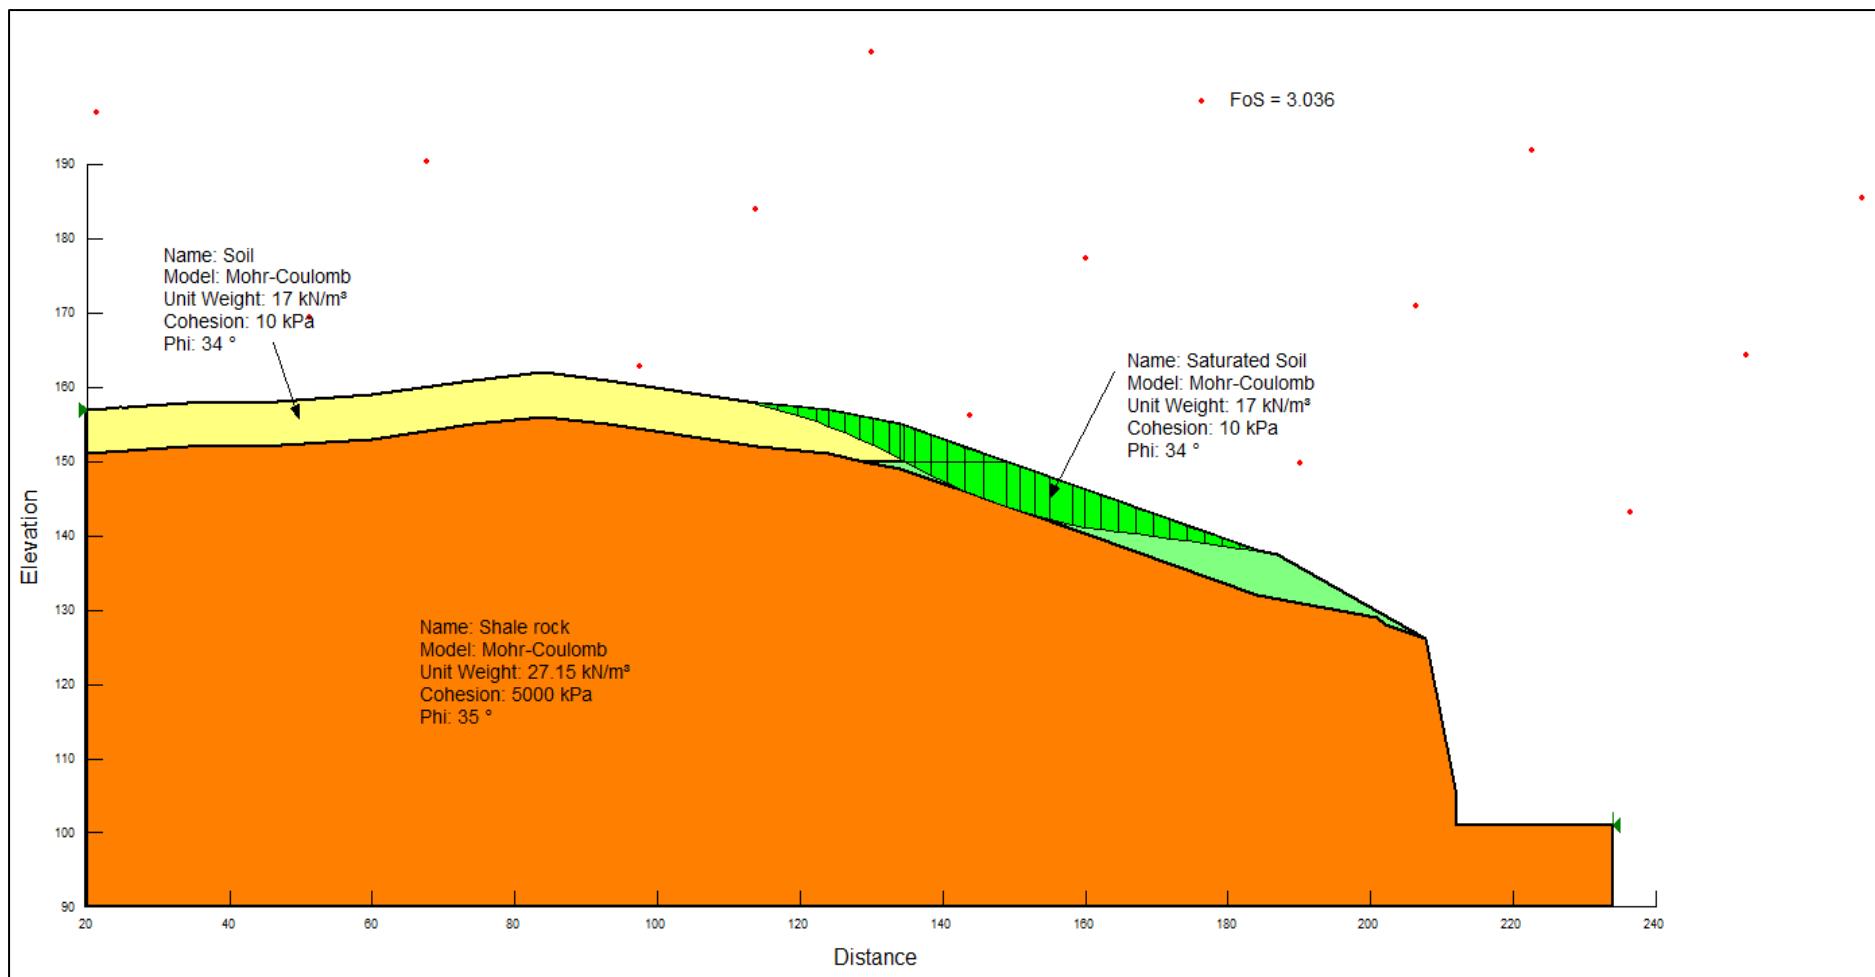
E.7: Inlet portal, Section 1, 1:0.2 excavation slope in shale, 1:2 excavation slope in soil
